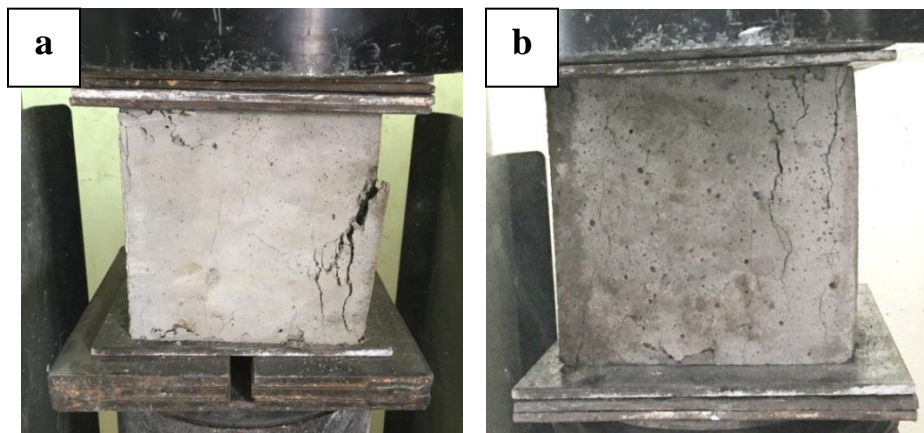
Failure pattern of a) Normal weight concrete b) Sawdust modified normal weight concrete
